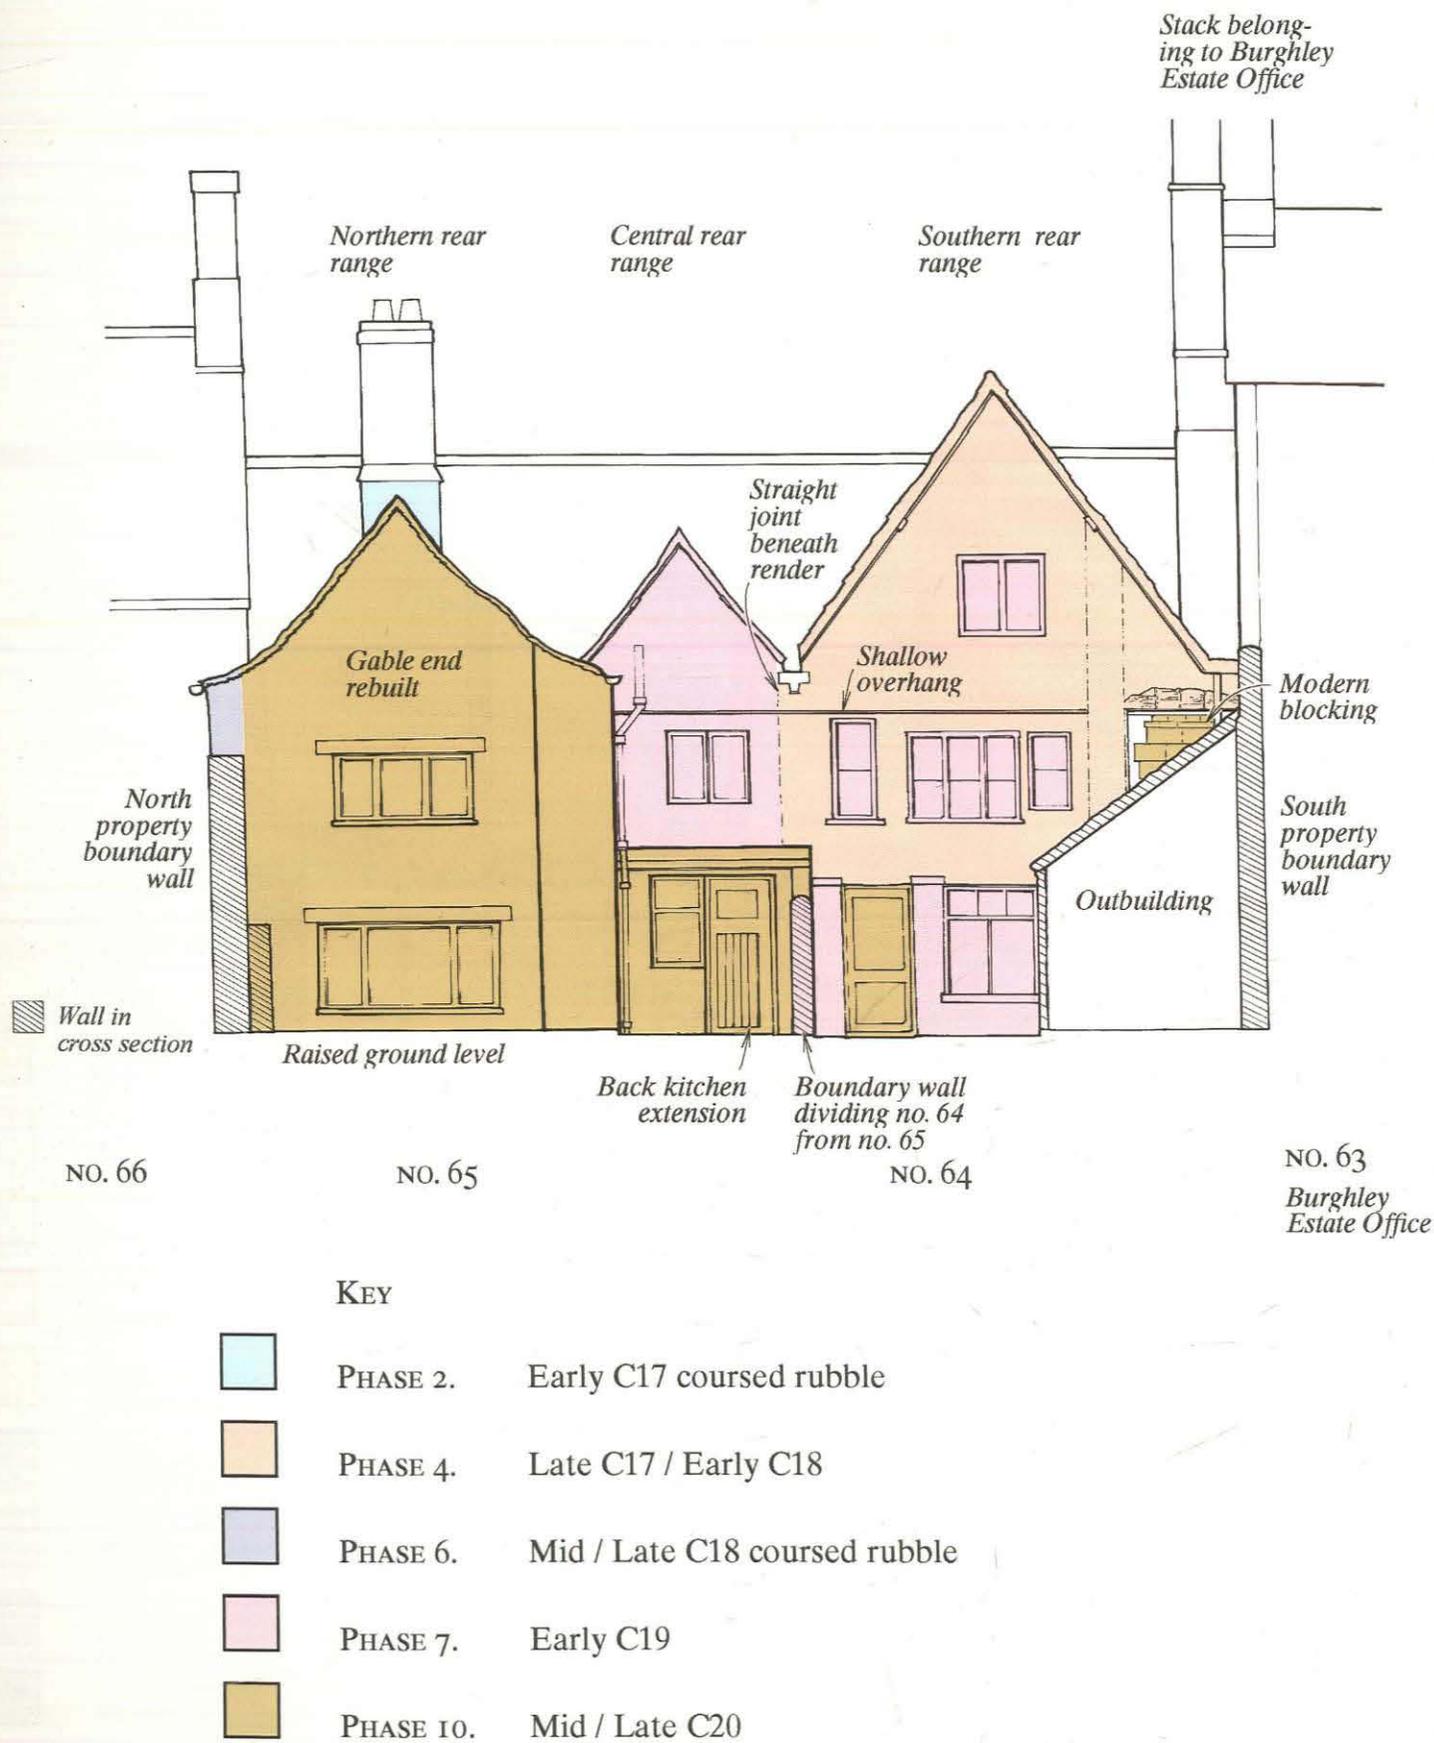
64/65 High Street St. Martin's; west (rear) elevation showing range of building materials and inserted features
